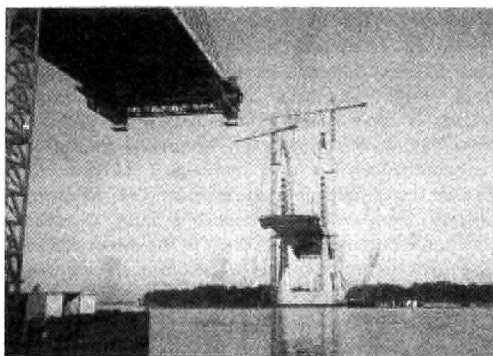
Construction of the Dame Point Bridge in Jacksonville, Florida (courtesy of Mary Lou Maher)
